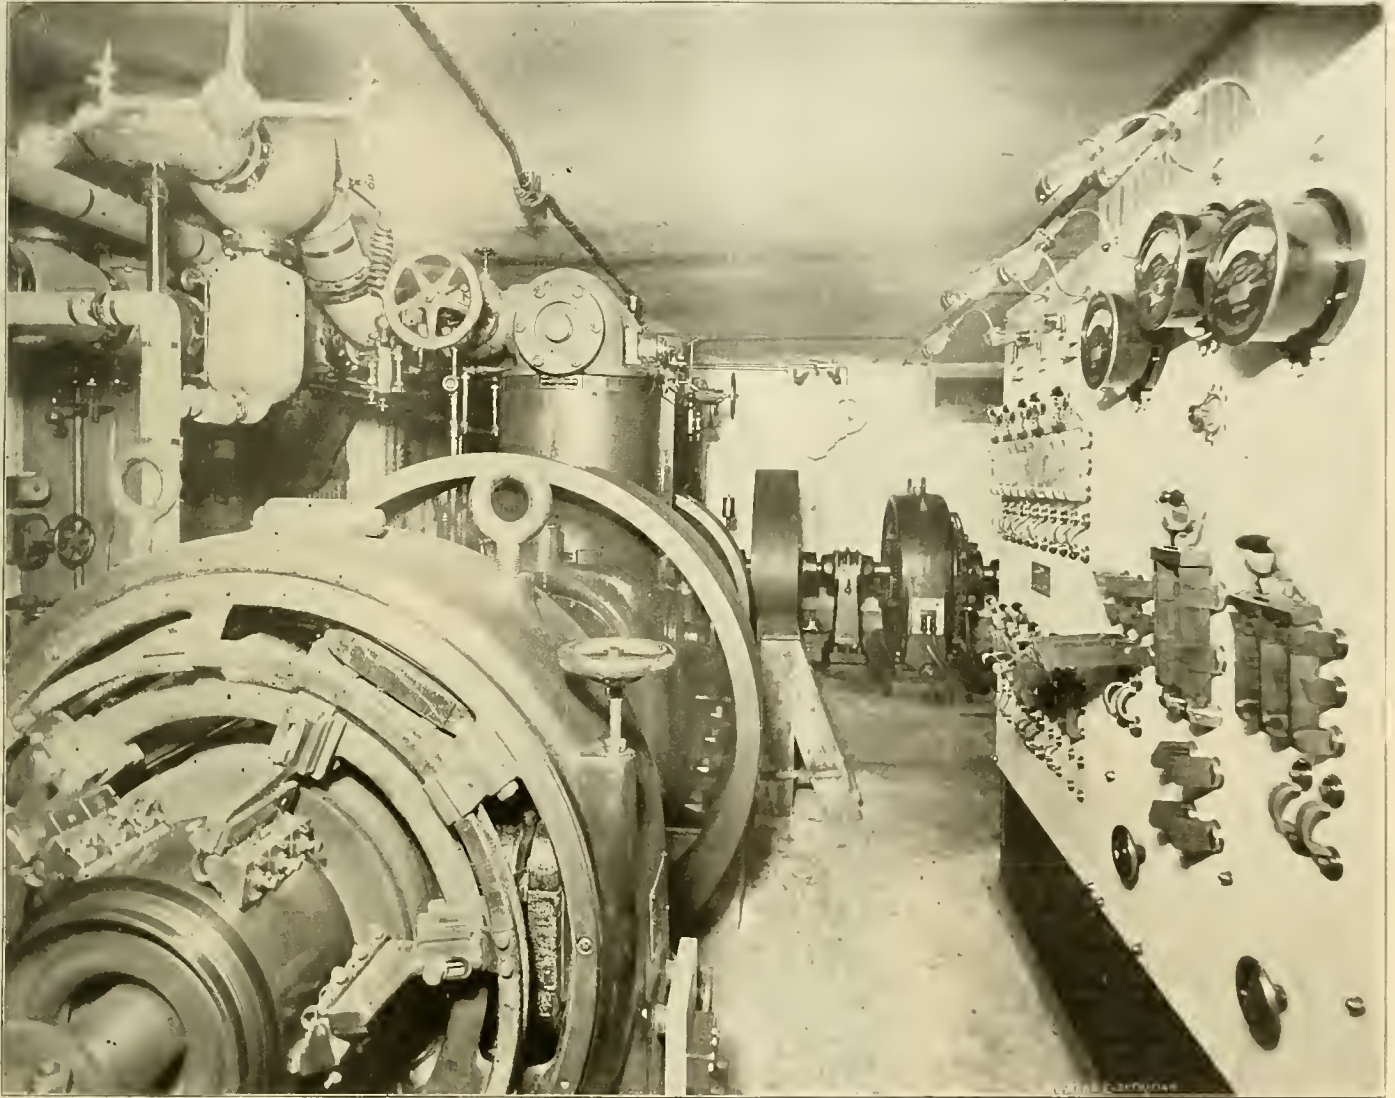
MECHANICAL AND ELECTRICAL EQUIPMENT OF THE UNION HOTEL.—ENGINES, DYNAMOS AND SWITCHBOARD.
